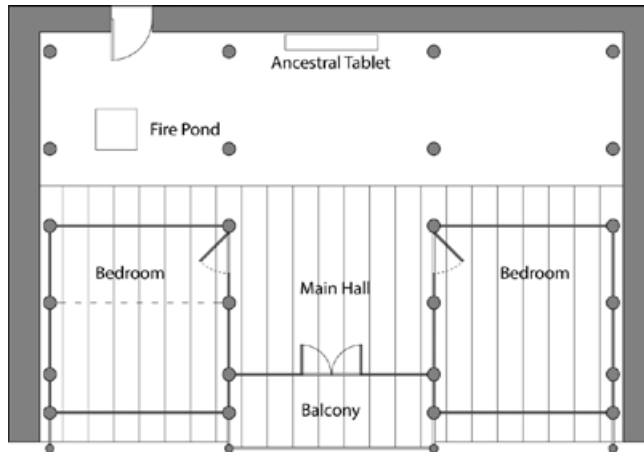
This plan of a common stilt dwelling reveals the shaded second floor, living area with a fire pit, kitchen area, ancestral tablet, sleeping spaces, and an open balcony. (Source: Author)
